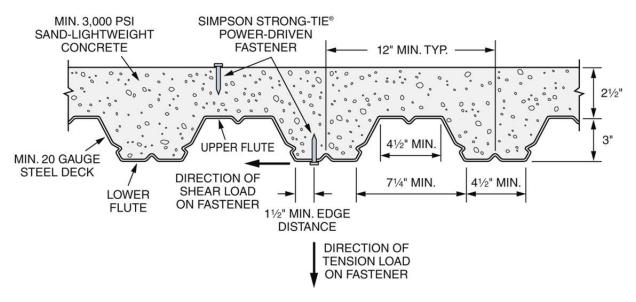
INSTALLATION IN 21/2-INCH CONCRETE FILL OVER 3-INCH-DEEP STEEL DECK
